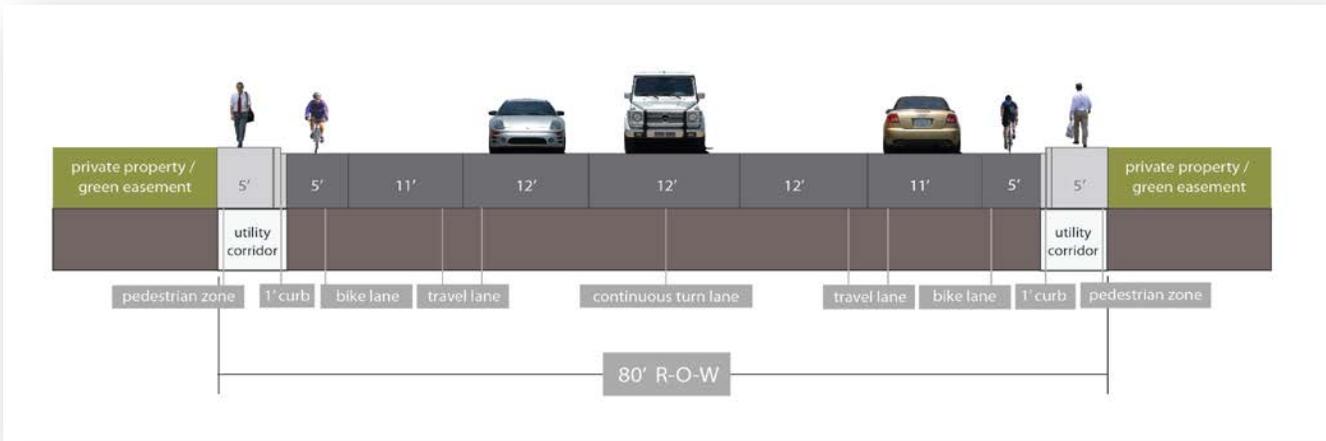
Improved Street Section – 80' - Russell Street to Young Street / Business 50
